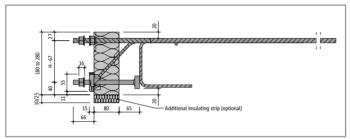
Schöck Isokorb® type KS14: Product cross section
